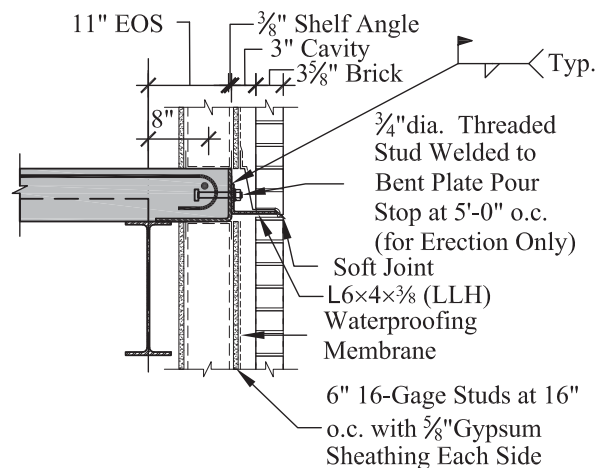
Section of slab edge with shelf angle supporting brick veneer.
